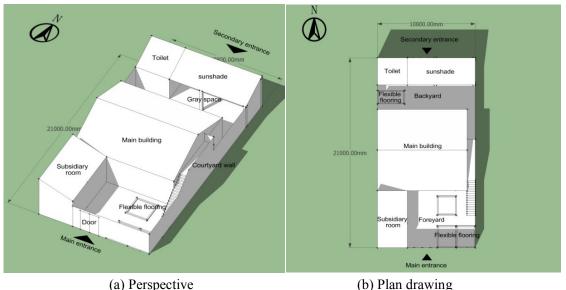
Diagram of flexible floor in vernacular dwelling
